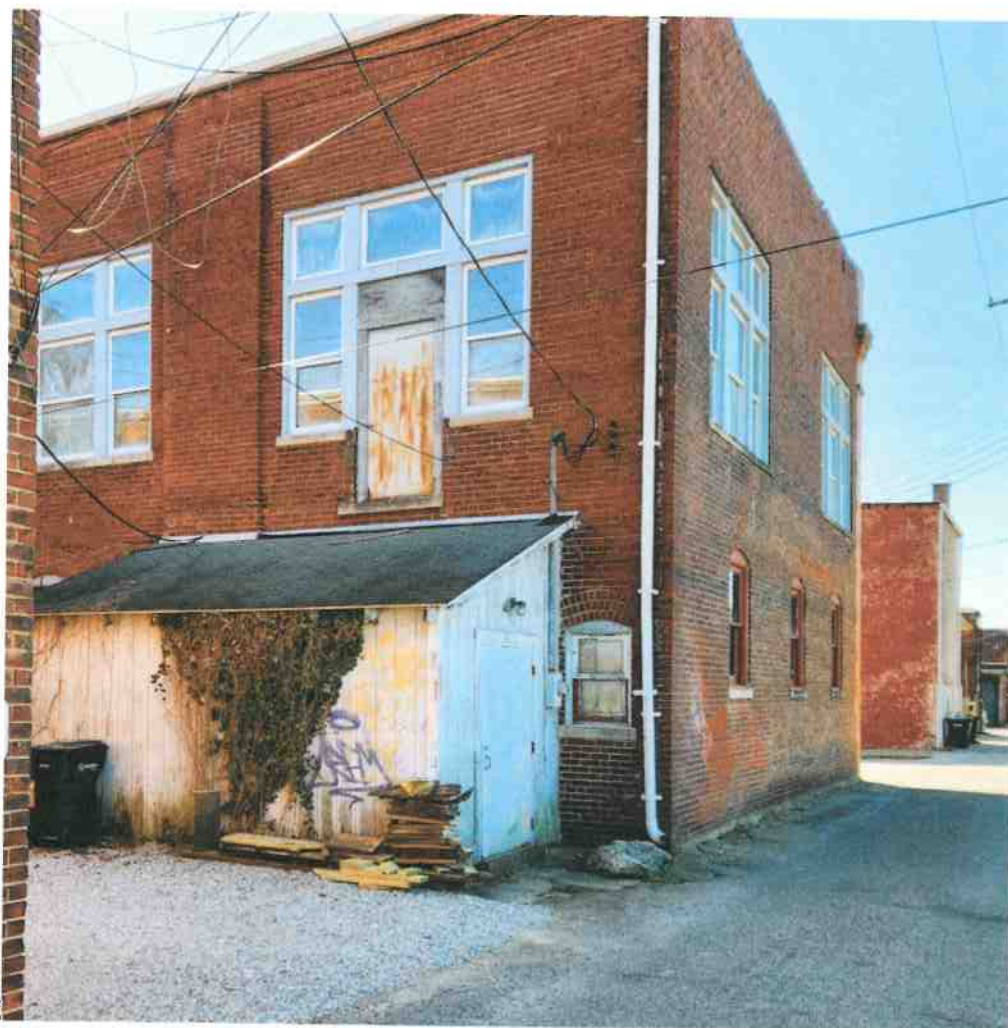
Rear (Northwest Corner from alley) of building showing dilapidated Shed and 2nd floor emergency exit to shed roof. Also note three (3) First floor windows on the north face of the building, to be replaced with glass block.
